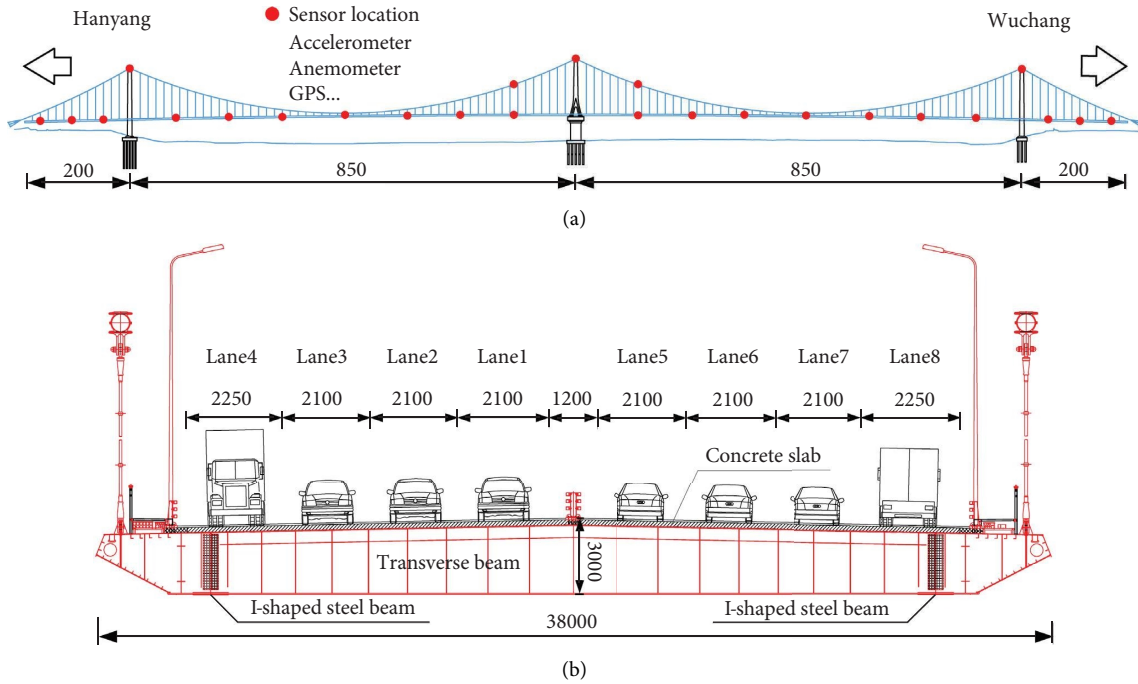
Yingwuzhou Yangtze River Bridge: (a) elevation view of the entire bridge (m); (b) cross section of the main girder (mm).
